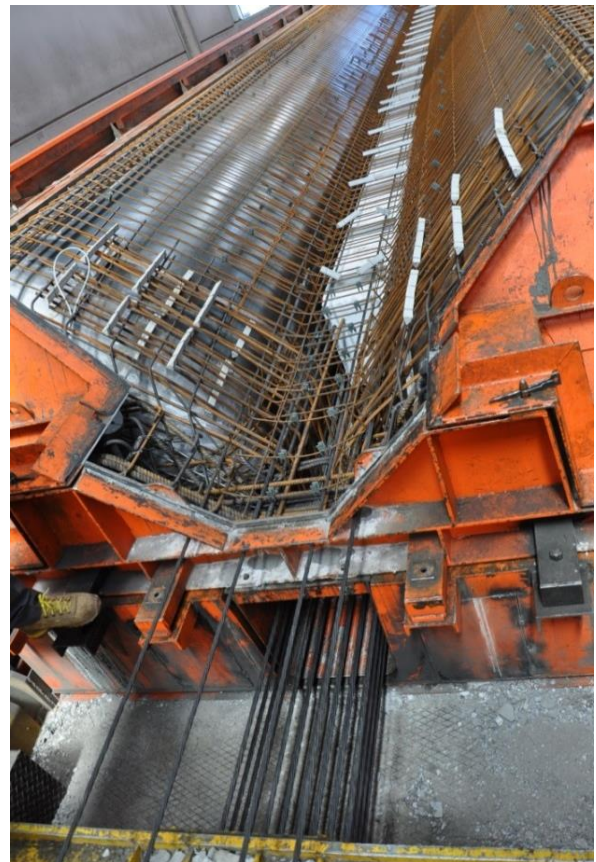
Particular view of the mould end with the disposition of mild and pre-stressing reinforcement / Particolare dell'estremità del cassero con la disposizione delle armature lente e di precompressione.
